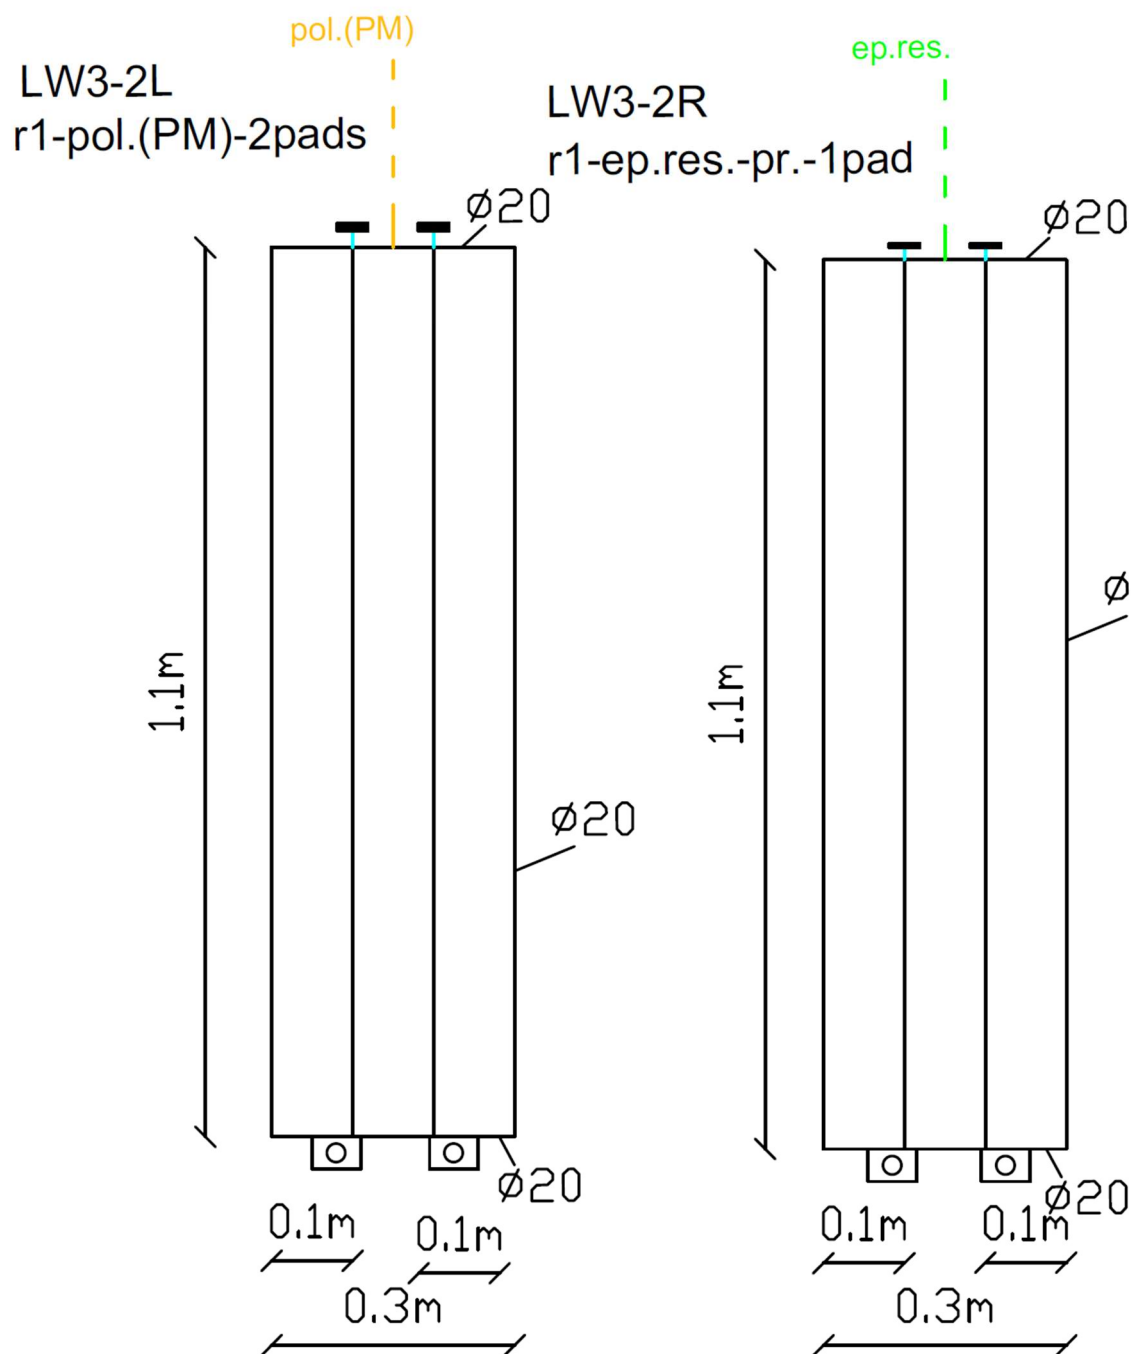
Living wall 3-2 (left side of frame between columns 3-2 LW3-2L) and living wall 3-2 (right side LW3-2R)
